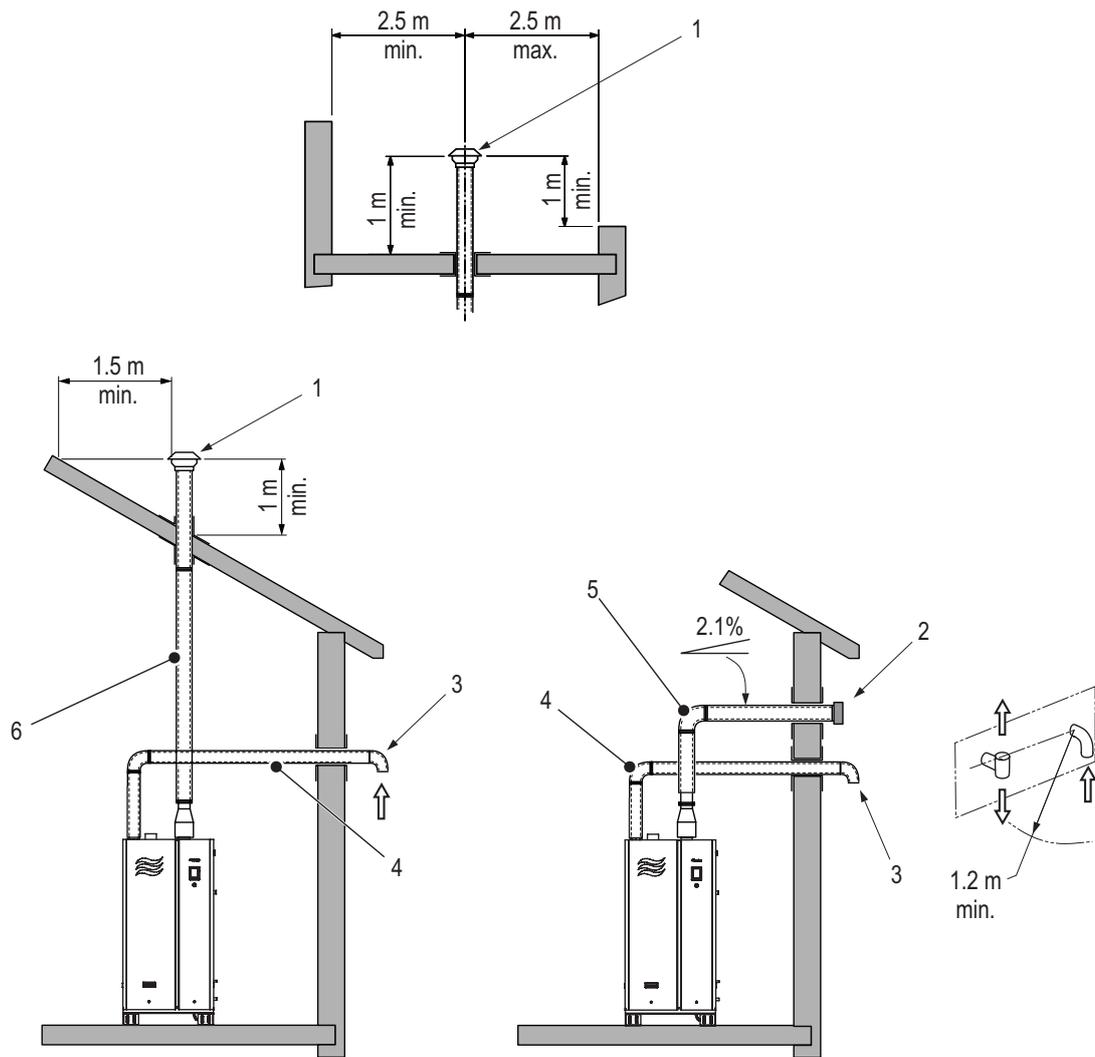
Type C53 Exhaust Venting for Room Seal Installations
